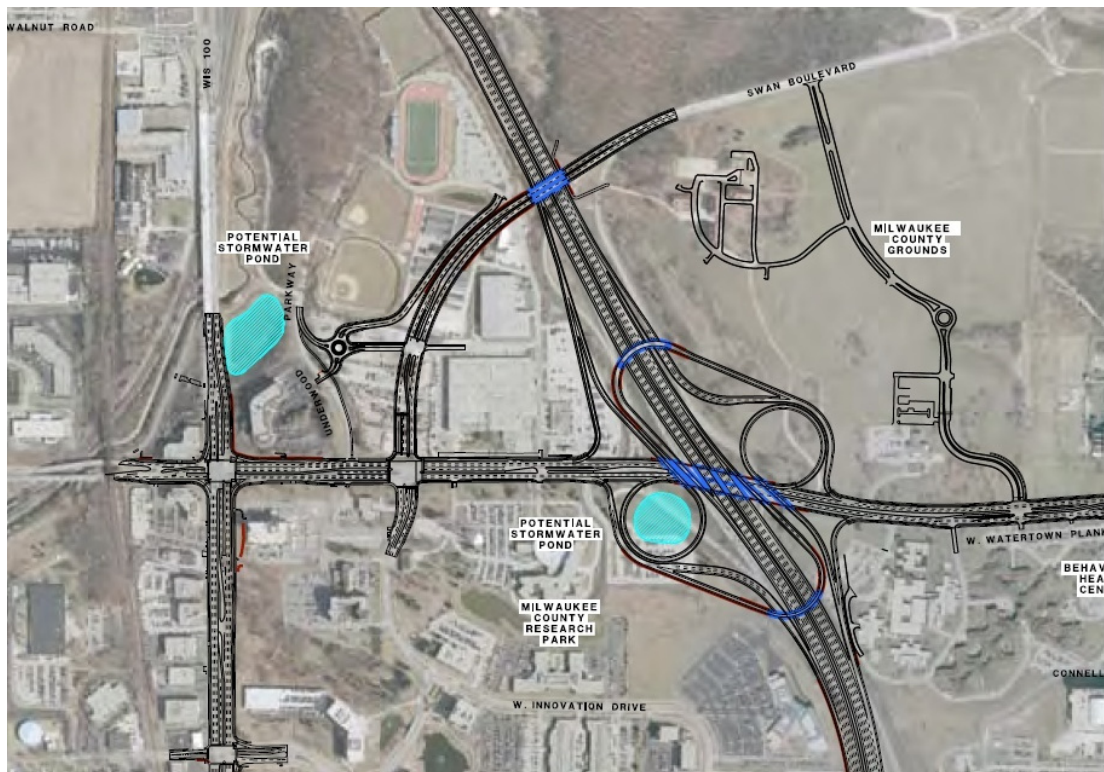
DOT planned changes to Watertown Plank Road. (Source: WisDOT)
